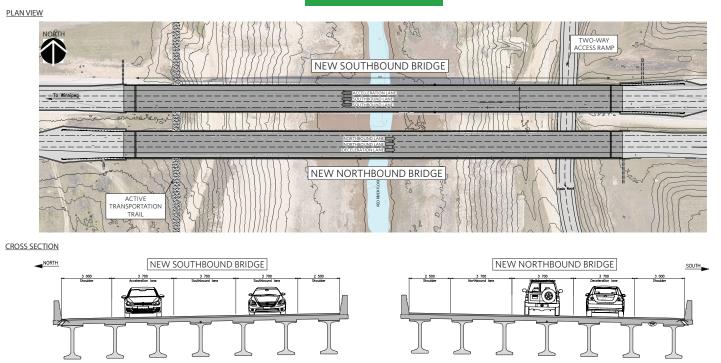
NEW BRIDGE STRUCTURES - PLAN VIEW AND CROSS SECTION
